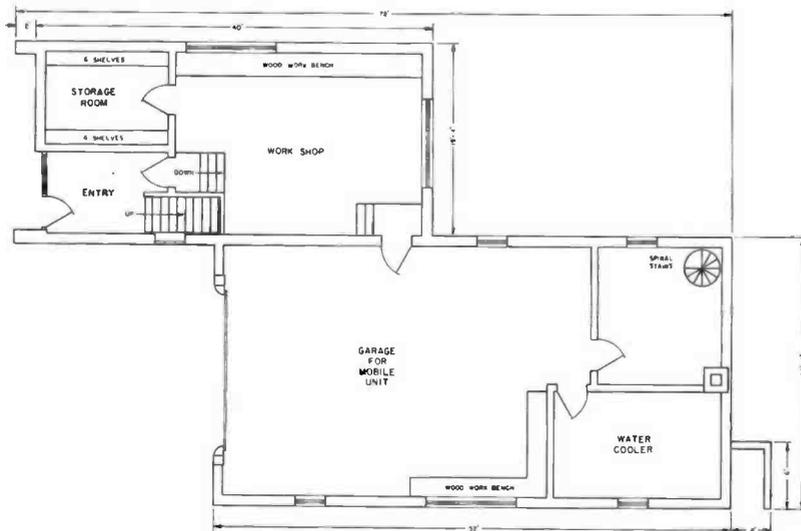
The first floor of the transmitter building, shown in Fig. 12, houses the mobile TV unit, a well-equipped workshop and air conditioning equipment.
